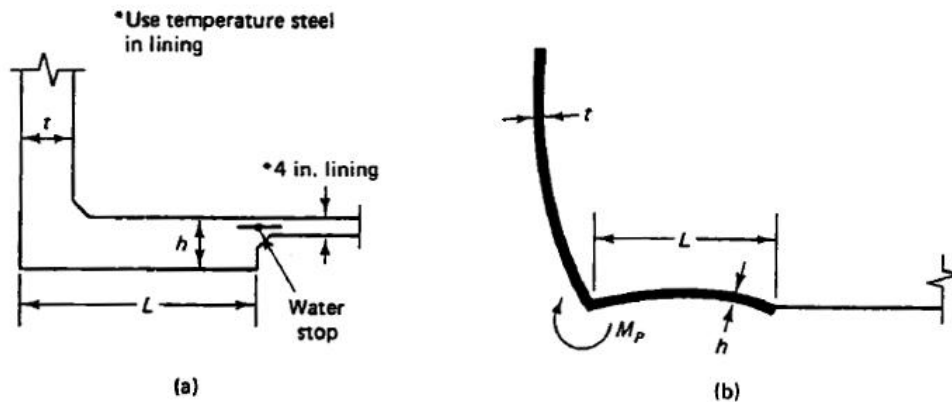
Deformed shape of base slab. (a) Wall base. (b) Deformed section.
